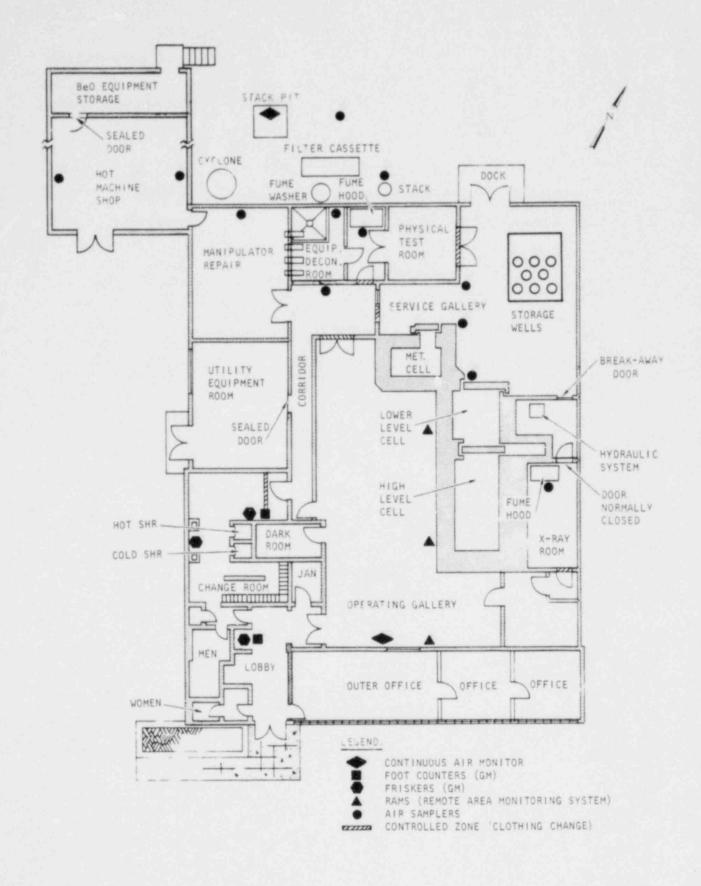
3.5-1 HOT CELL FACILITY FLOOP PLAN
